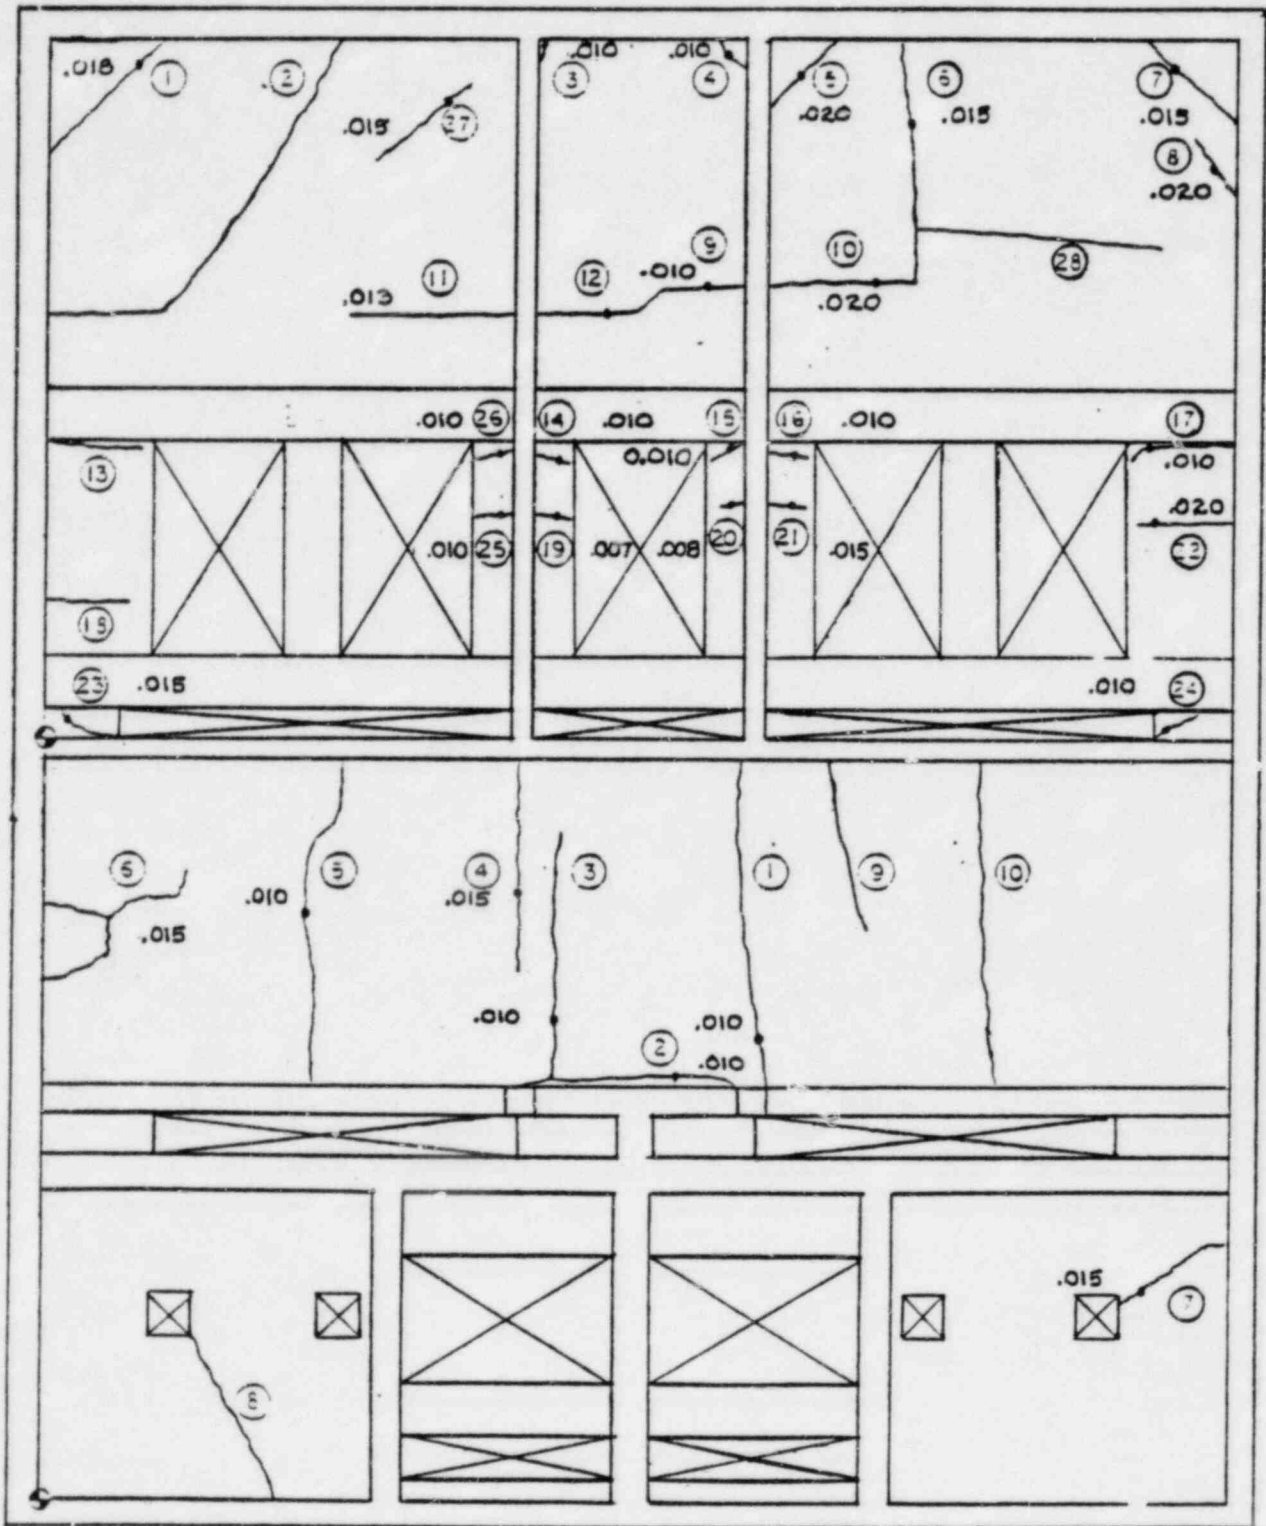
(b) Cracking in South Face of South Wall of Service Water Pump Structure from Bechtel Drawing C-2040 Revision A (Crack Widths in Inches)
